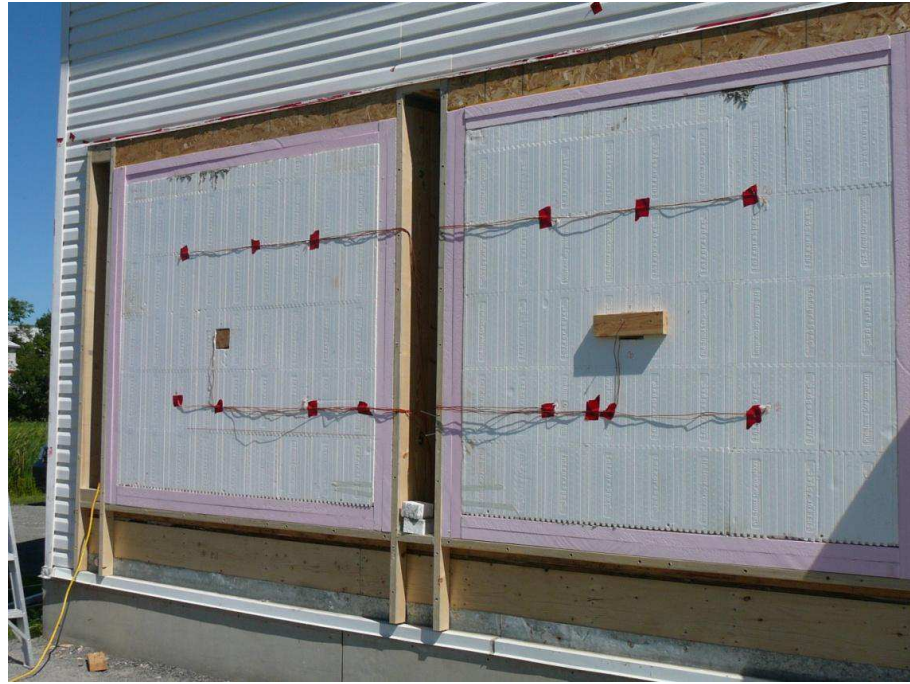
Instrumentation installed on the exterior of the walls, wires run to the chase between the two ICF specimens.
